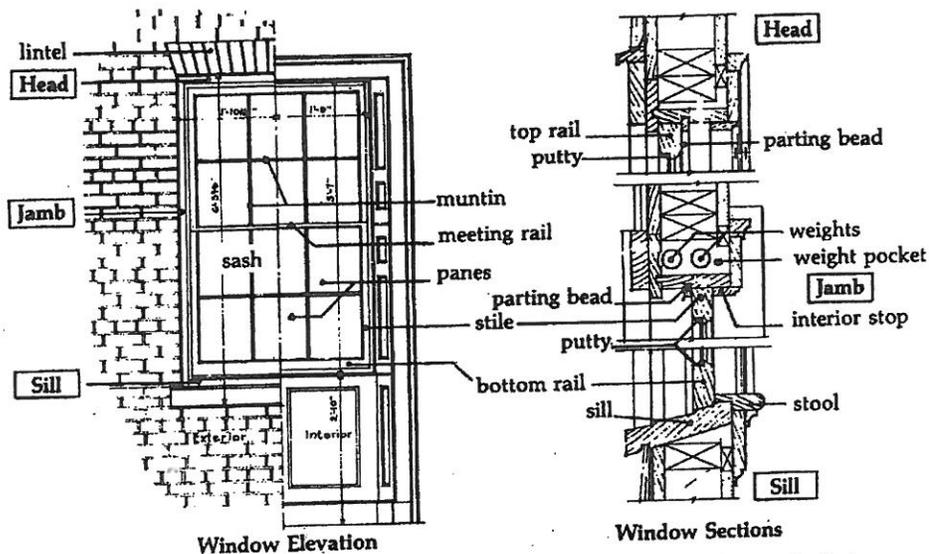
The above drawings identify a variety of the elements of historic wood windows such as those found throughout downtown Peekskill. [from Preservation Brief No. 9, *The Repair of Historic Wood Windows*]
